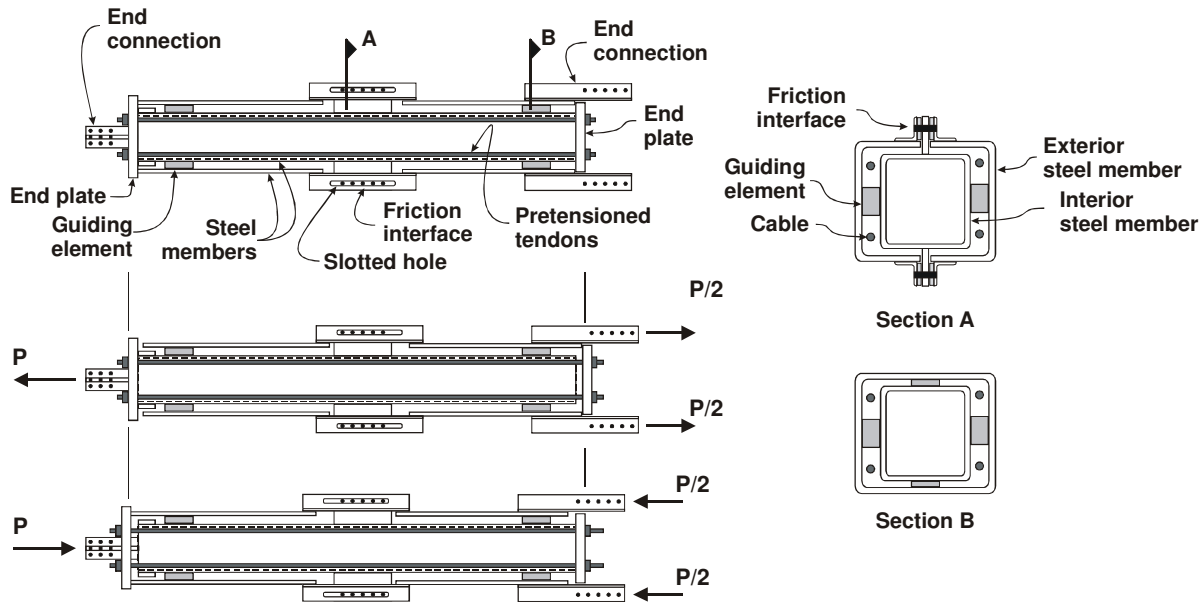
PT-SCED bracing member built with structural tubing members and friction energy dissipation mechanism.
